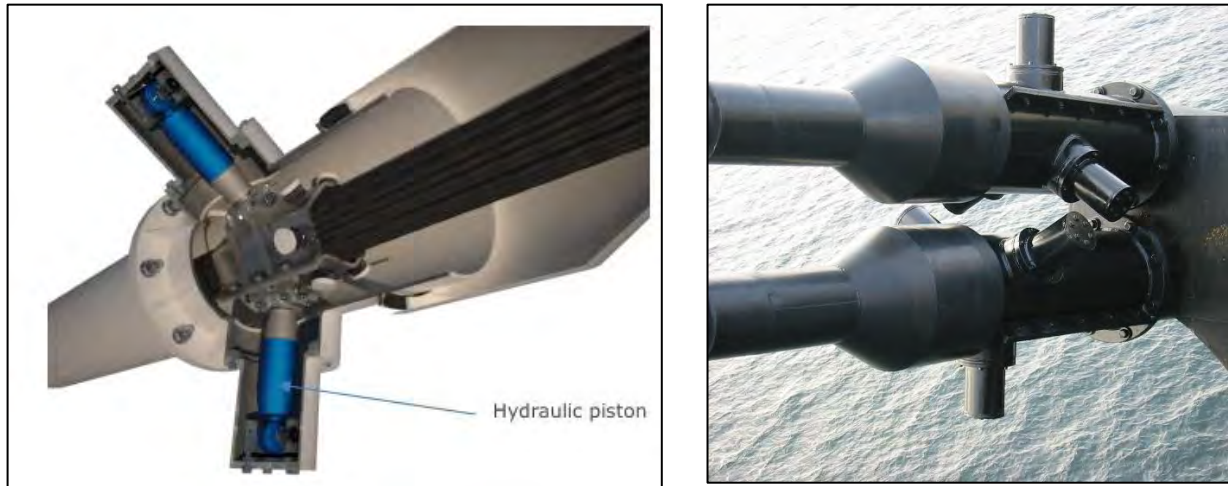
Hydraulic stay cable damper (Freyssinet IRD type). Cross section view (left). External view twin stay cables, Øresundsbron [right]
